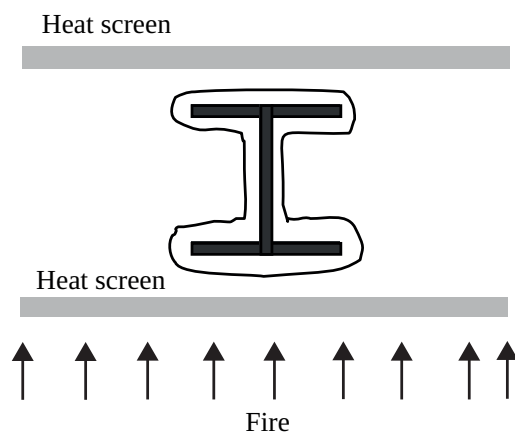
Protected steel column with heat screens on both sides (plan view)
